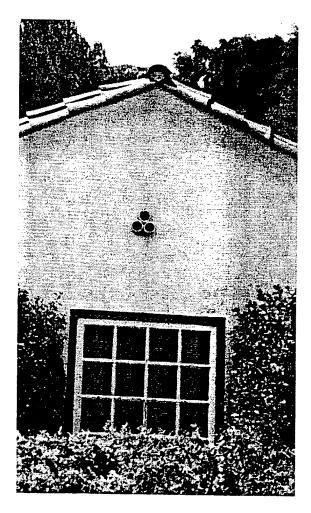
ARCHITECTURAL DETAIL EXAMPLES
